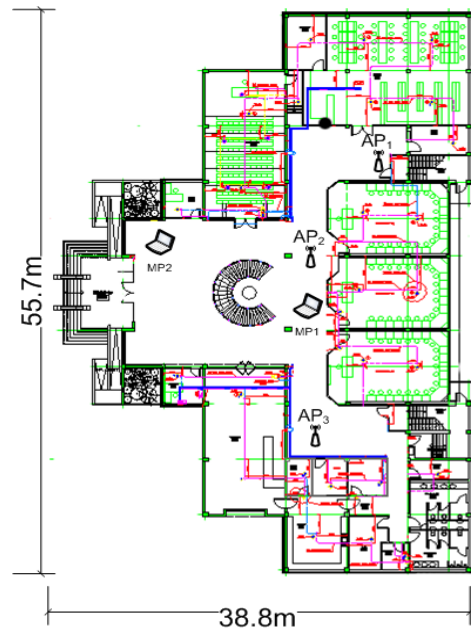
Floor plan of the area where the *DfP* experiment was performed.
